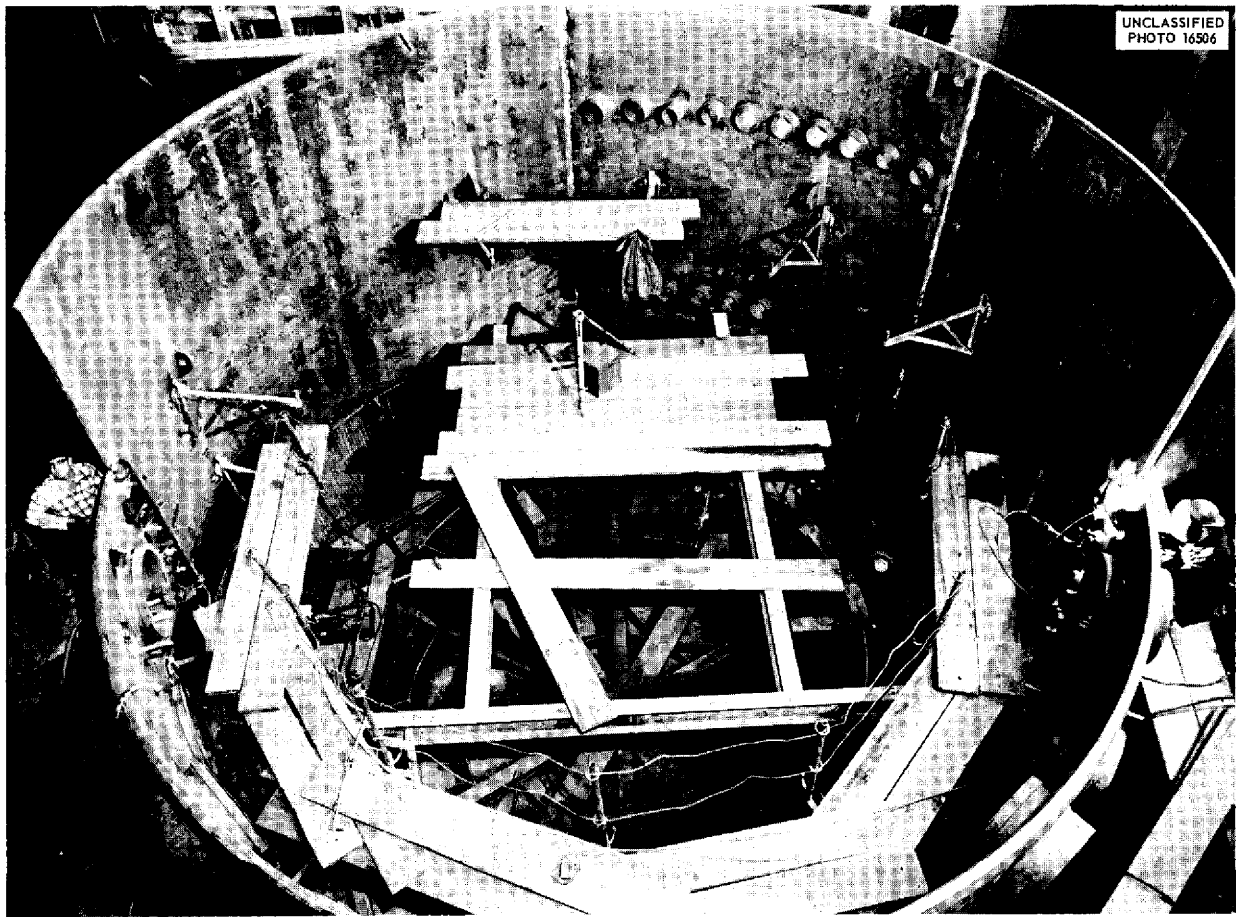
Interior View Across Building Addition Looking Toward Southeast. Photograph taken Feb. 10, 1956.
